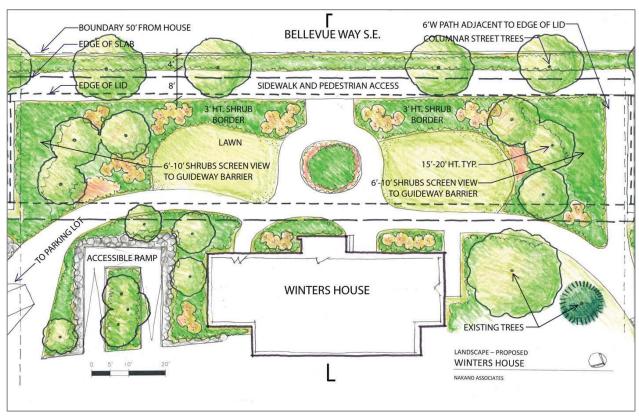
Preferred Alternative B2M Winters House Proposed Conceptual Landscape Plan
